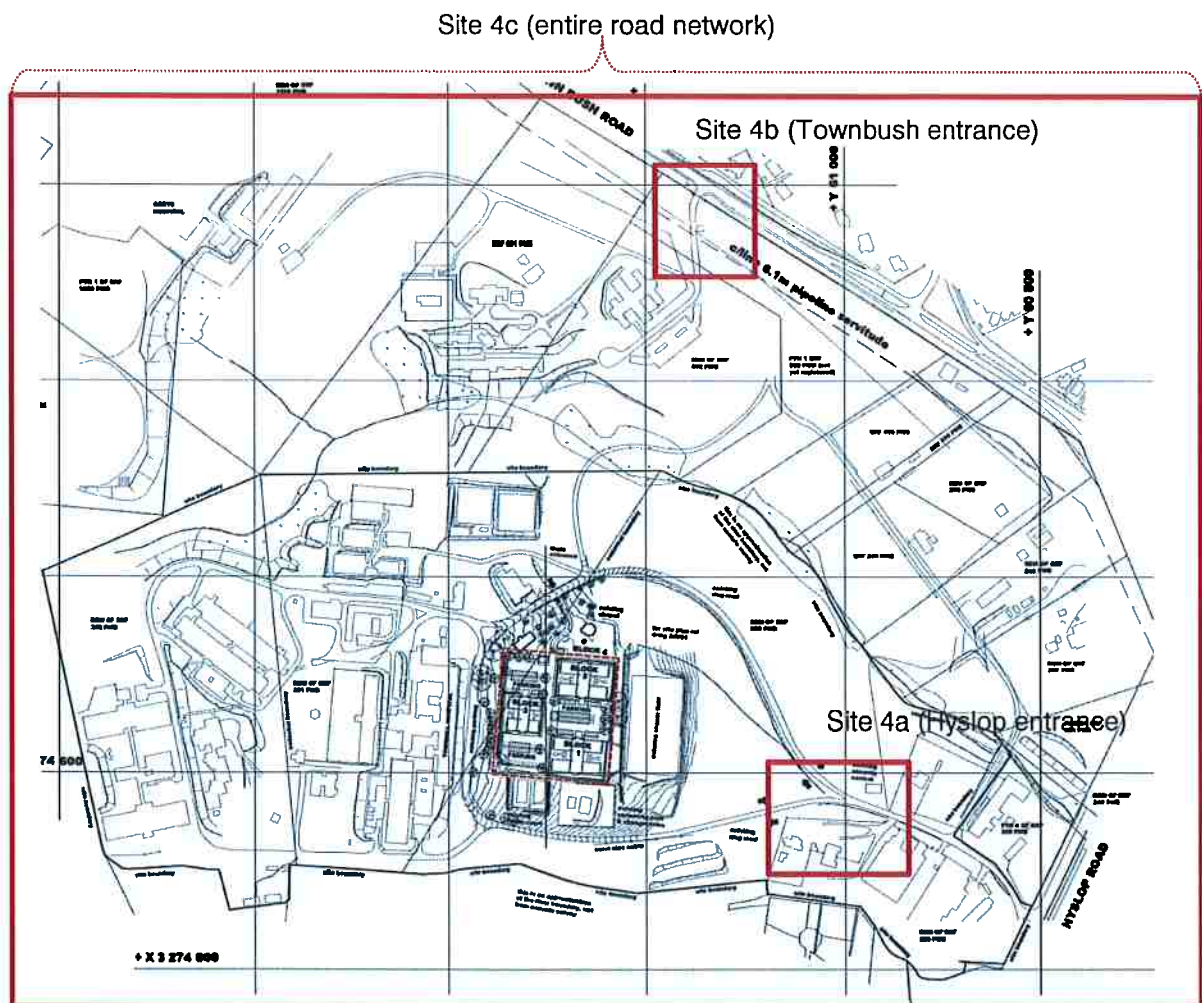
Proposed Site 4a, Site 4b and Site 4c
